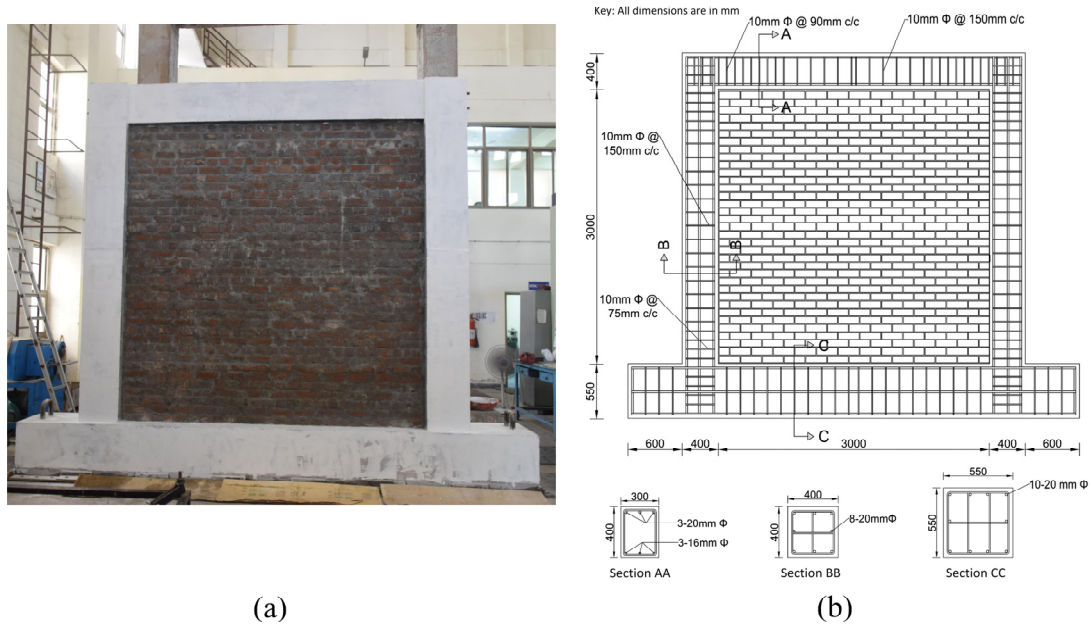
(a) Burnt Clay Brick Masonry Infilled RC Frame; and (b) Reinforcement Detailing of the RC Frame.
